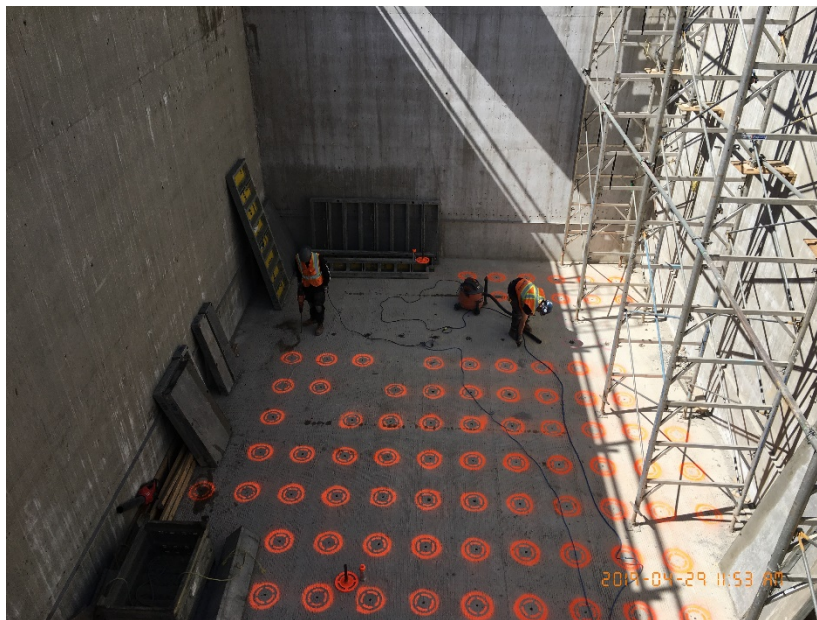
McLoughlin Point Wastewater Treatment Plant: drilling of holes for BAF mono floor.
